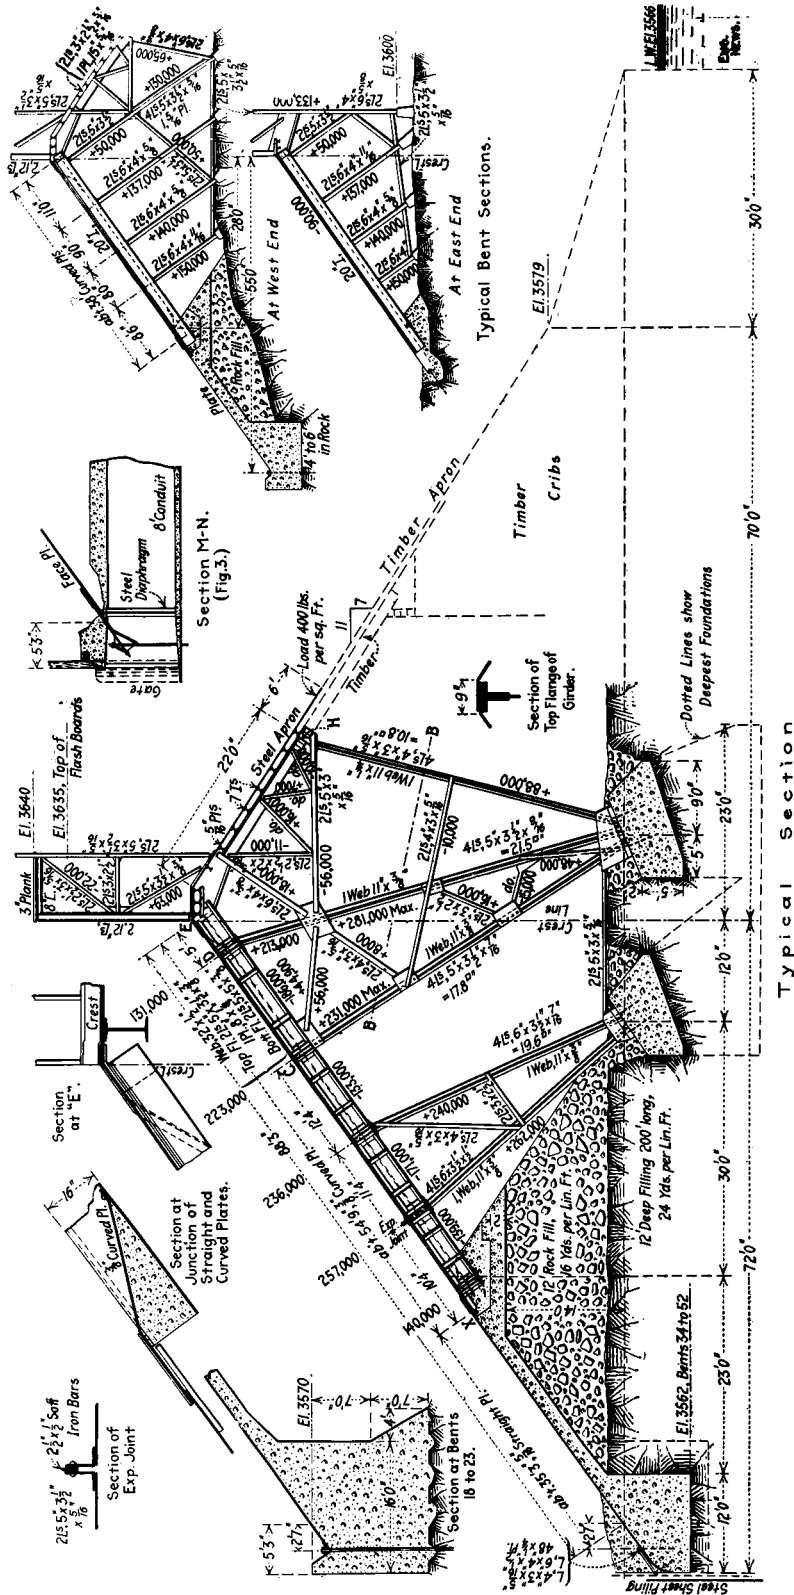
Cross-section of the Hauser Lake, Montana, steel dam, 1907. The footings on which the steel bents rested were embedded in water-bearing gravel since bedrock was 40 to 60 feet deep at the dam site. The steel sheet piling driven in front of the dam (far left) was intended to prevent water from seeping under the dam and undermining the footings and hence the steelwork. From Engineering News 58 (November 14, 1907): 508.
